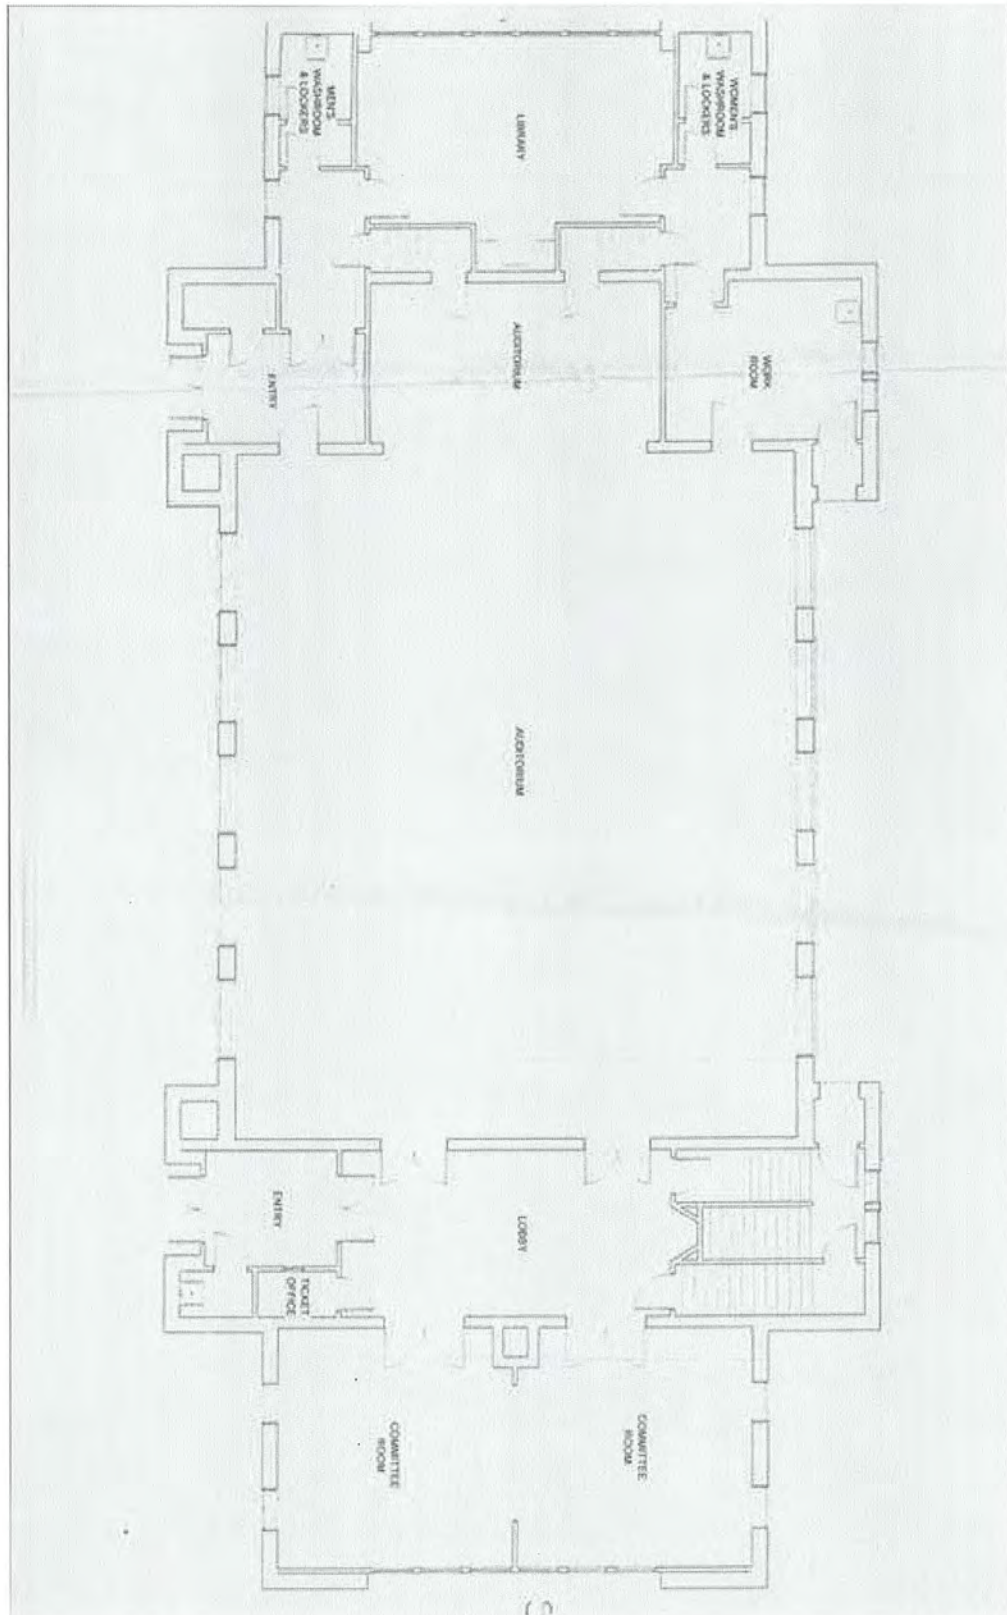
First floor plan in 1934. Copy of original drawing owned by John Kreft, Elbow Lake.
